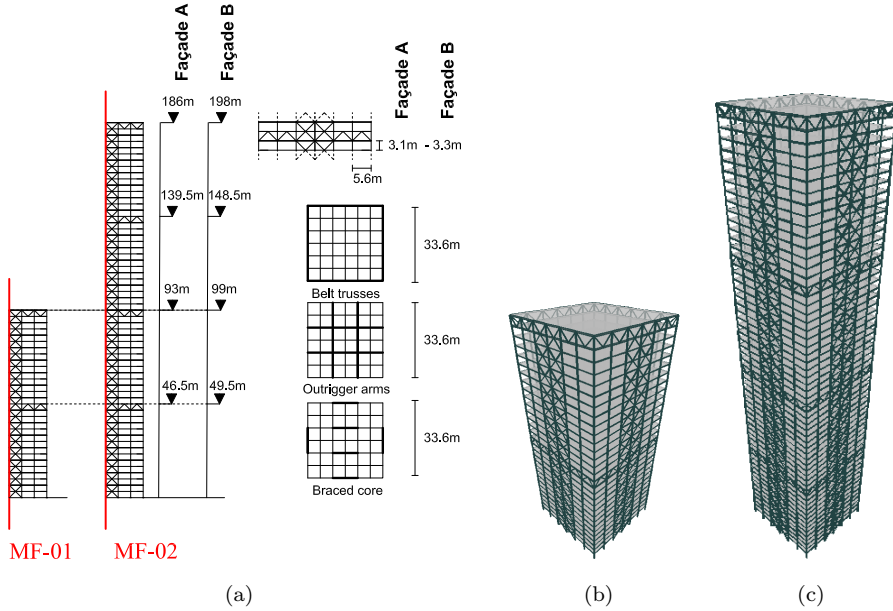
Case-study buildings: plan and section geometries (a), MF-01, thirty-storey frame (b), MF-02, sixty-storey frame (c).
